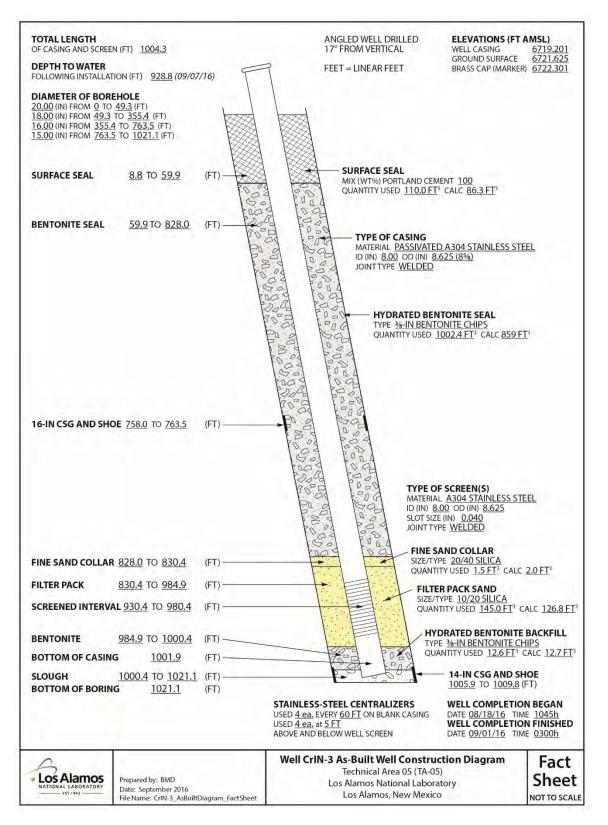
Injection well CrIN-3 as-built well construction diagram
